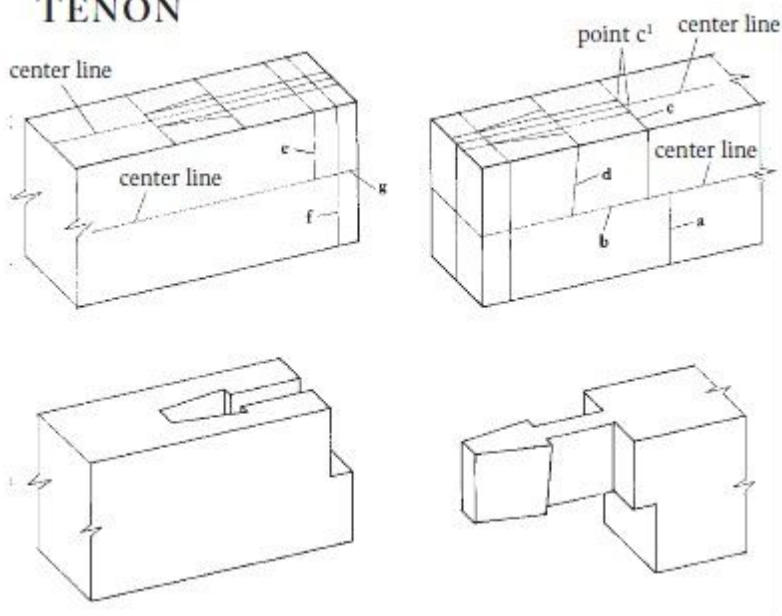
Half-lapped “gooseneck” splice joint. Top: Joint laid out. Bottom: Completed mortise and tenon.
